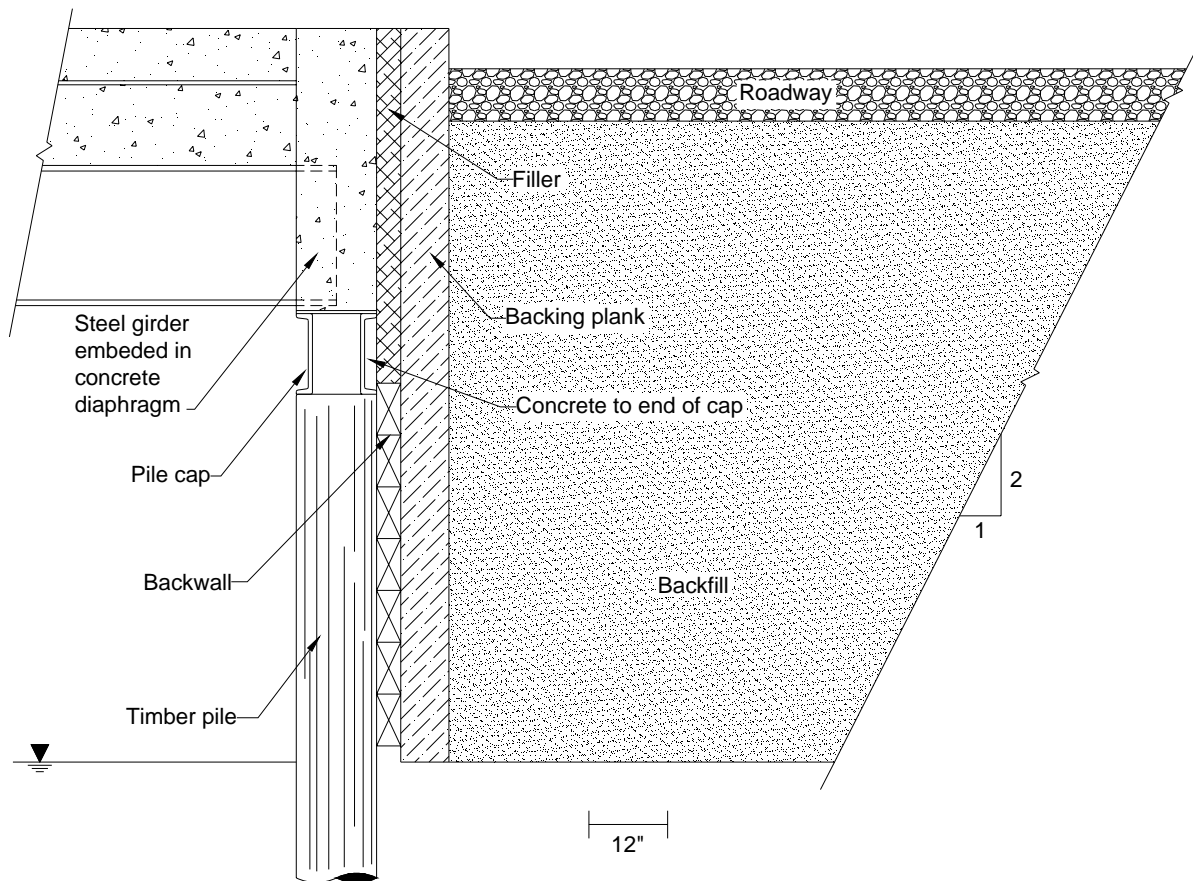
Schematic diagram of the bridge cross section (reproduced from the bridge construction plans)
